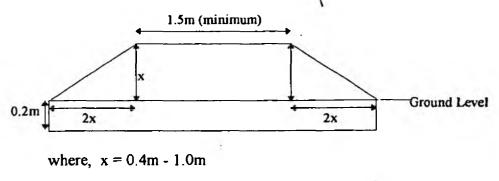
Design of retaining embankments at the Quaking Houses wetland.
